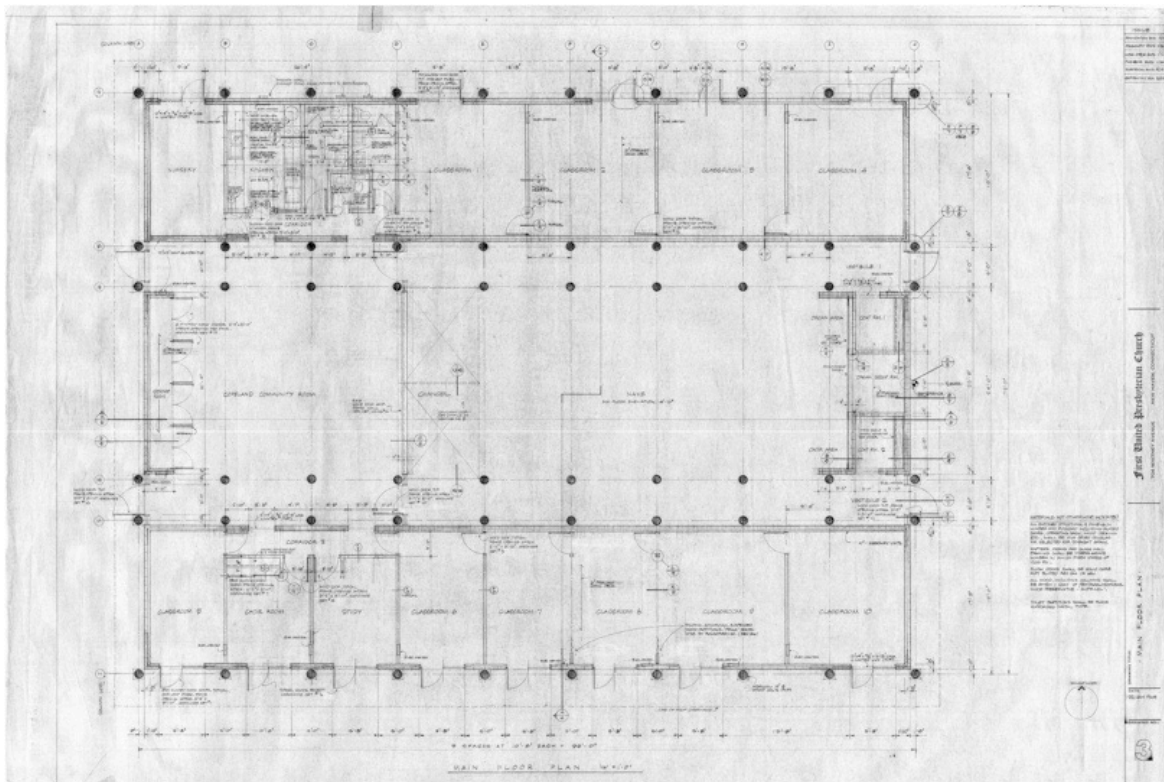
Building plan, 1966, Jim Owens and John Dinkeloo.
